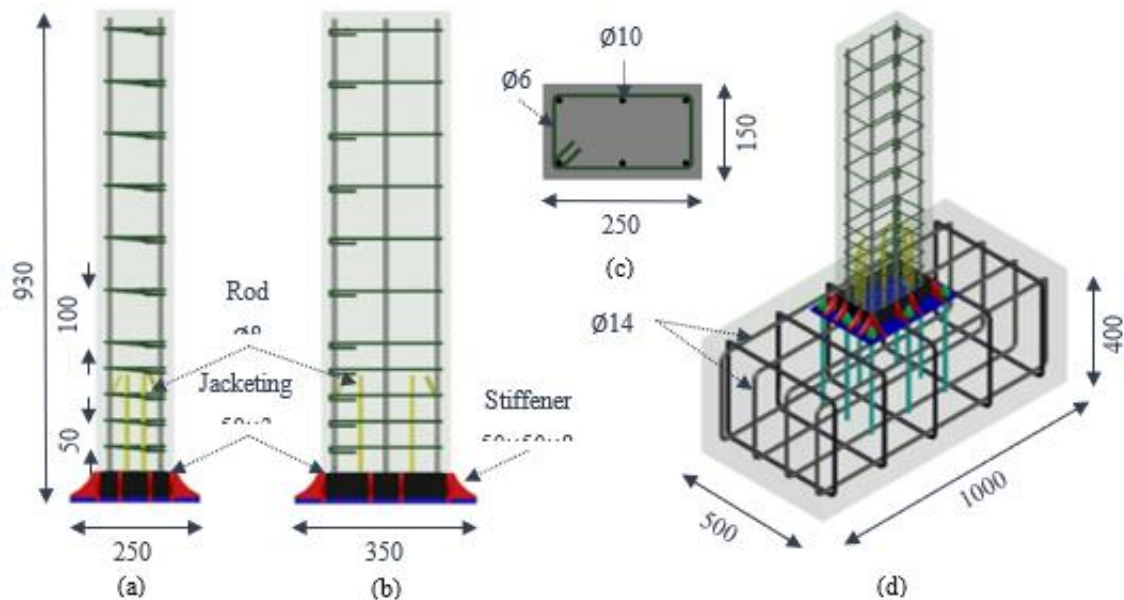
Details of the monolithic specimen: (a) side view, (b) front view, (c) cross-sectional view, and (d) isometric view (unit: mm)
